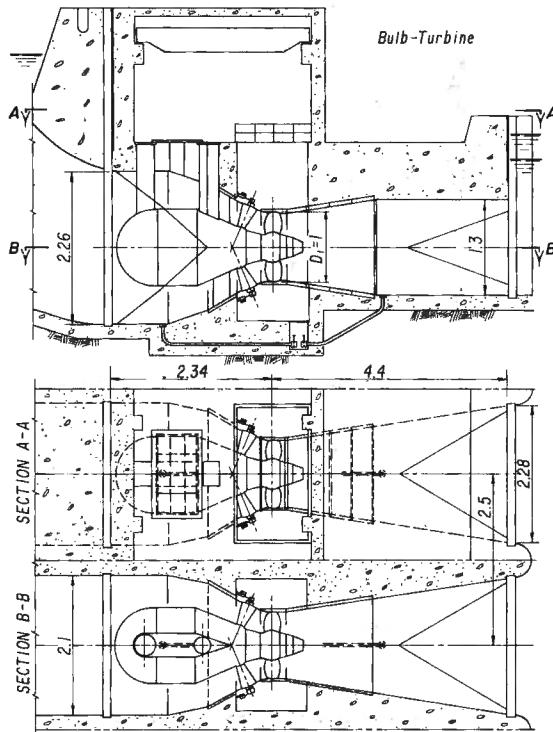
Standard Bulb Turbine Flow Passage Dimensions (Escher Wyss)
